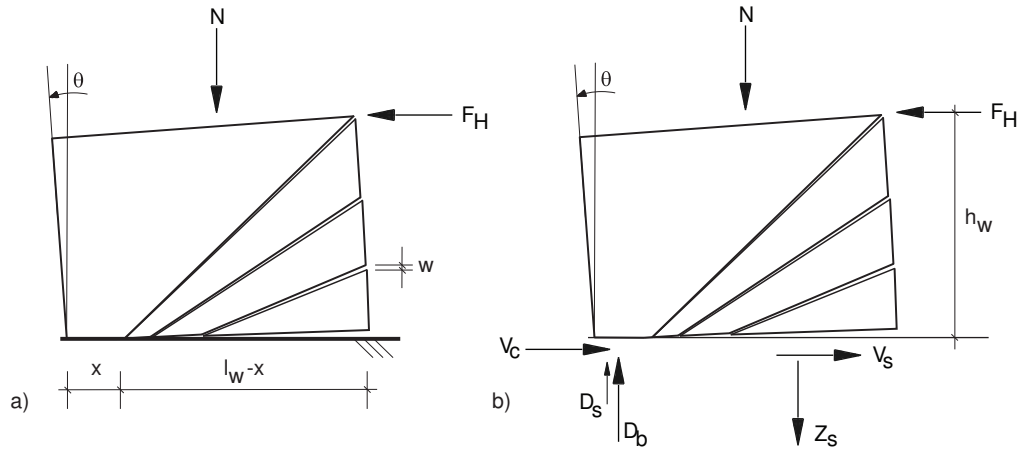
Wall with discrete crack modeling, a) model geometry, b) reaction forces in the base joint.
